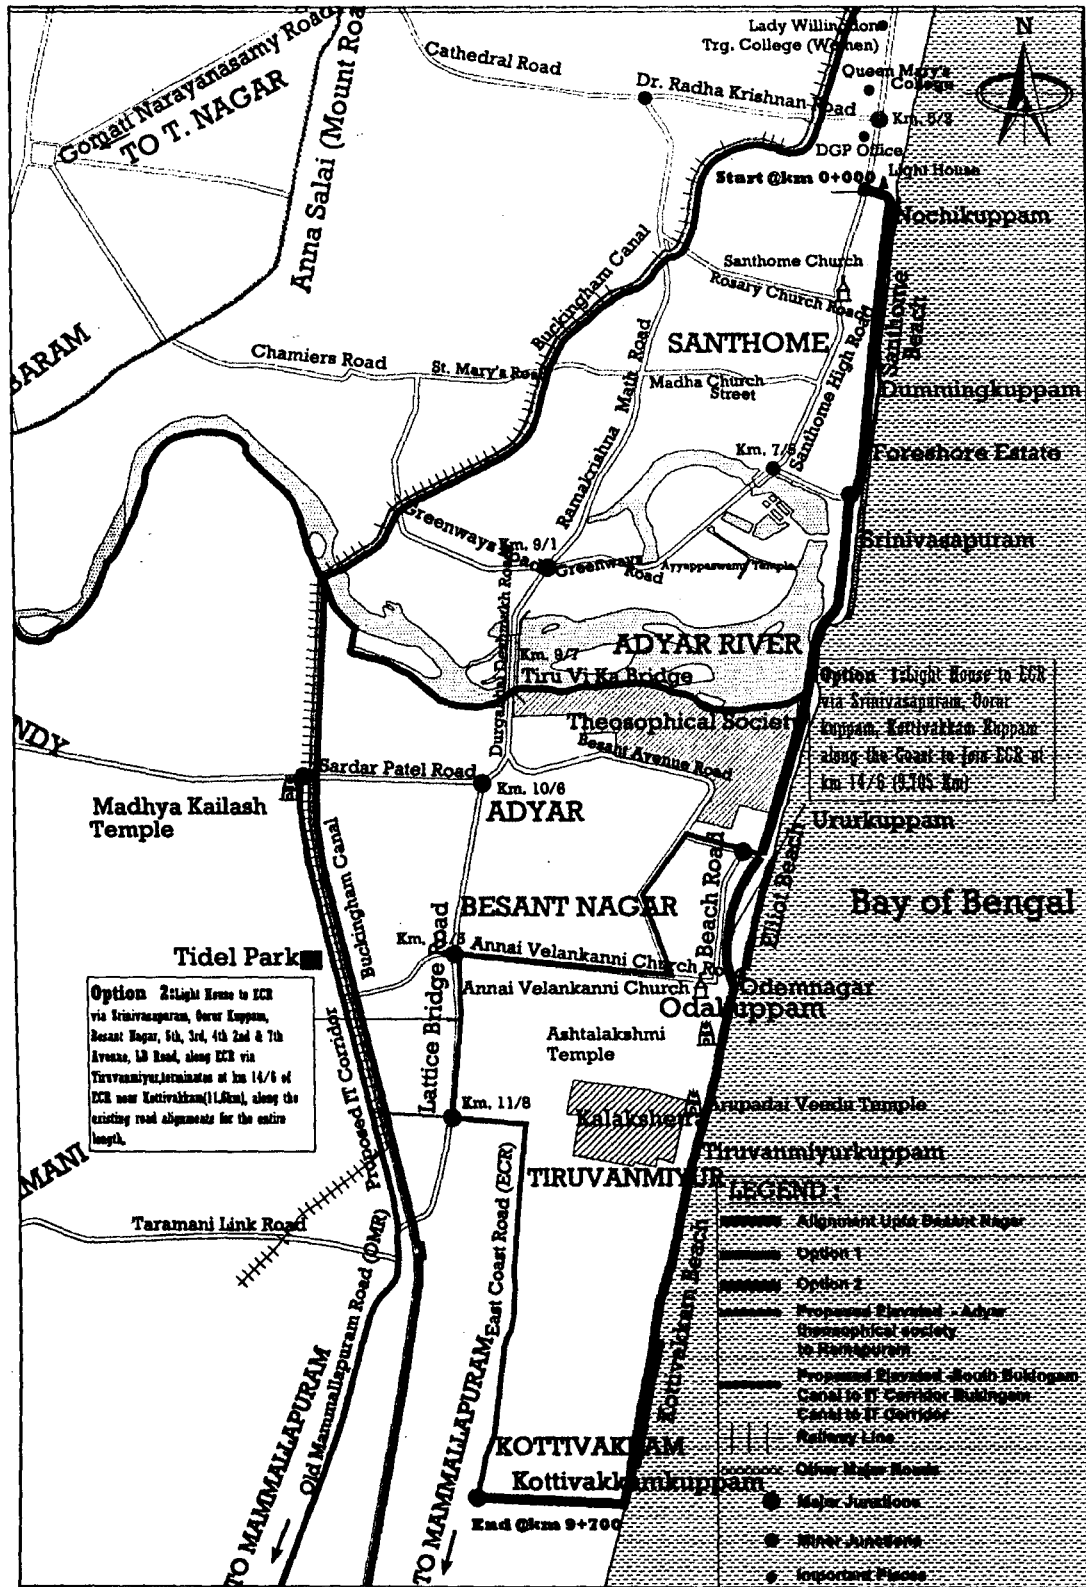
Alignment Options for Elevated Road between Light House and ECR
